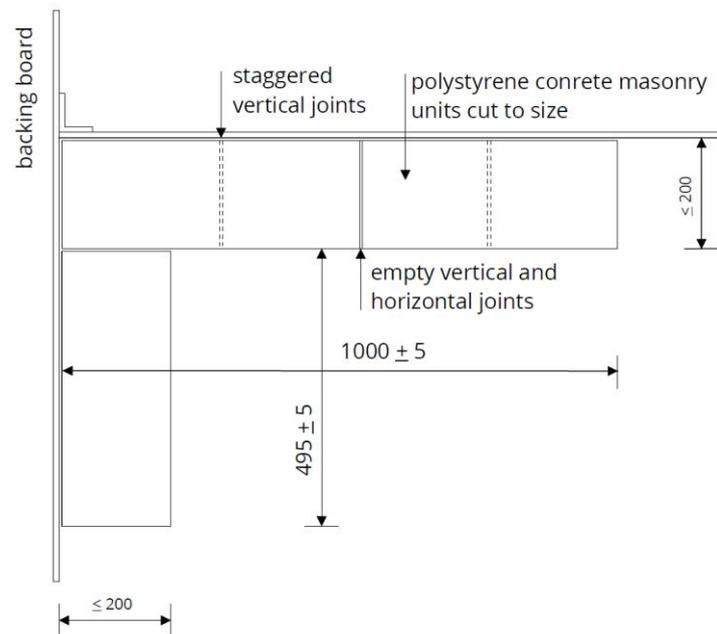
Test rig configuration for polystyrene concrete masonry units
